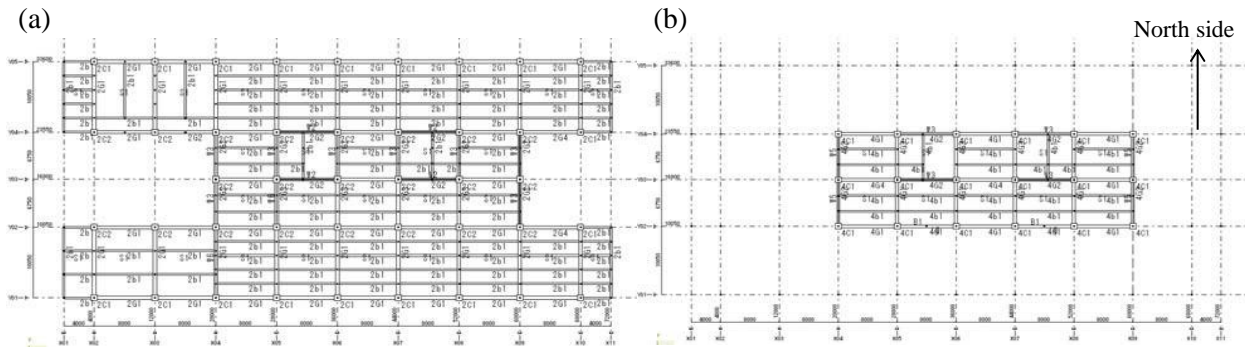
Floor plan: (a) lower floors (first and second floors) and (b) upper floors
